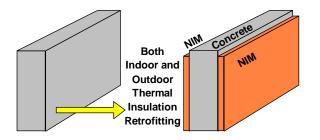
Both indoor and outdoor thermal insulation retrofitting of concrete with NIMs.
